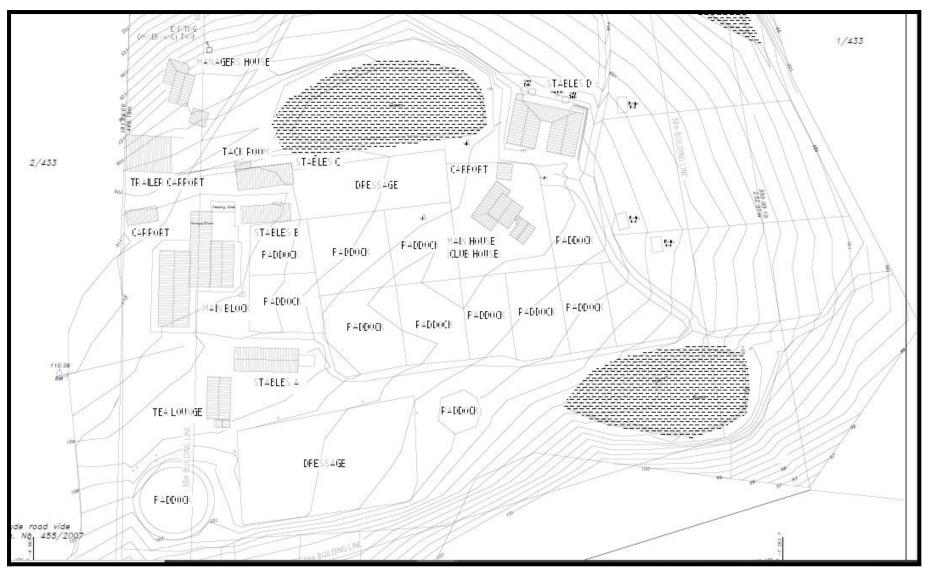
A: PROPOSED SITE DEVELOPMENT PLAN
